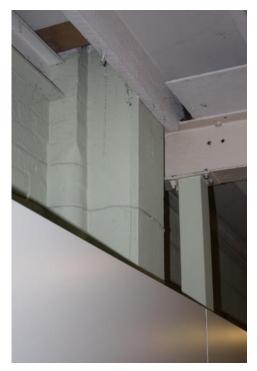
Sample of the chamfering detail on the columns along the wall of Room 1
